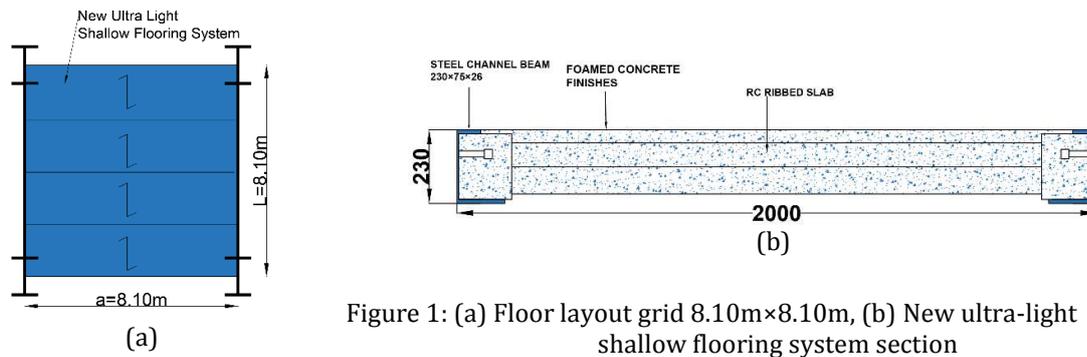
(a) Floor layout grid 8.10m×8.10m, (b) New ultra-light shallow flooring system section
